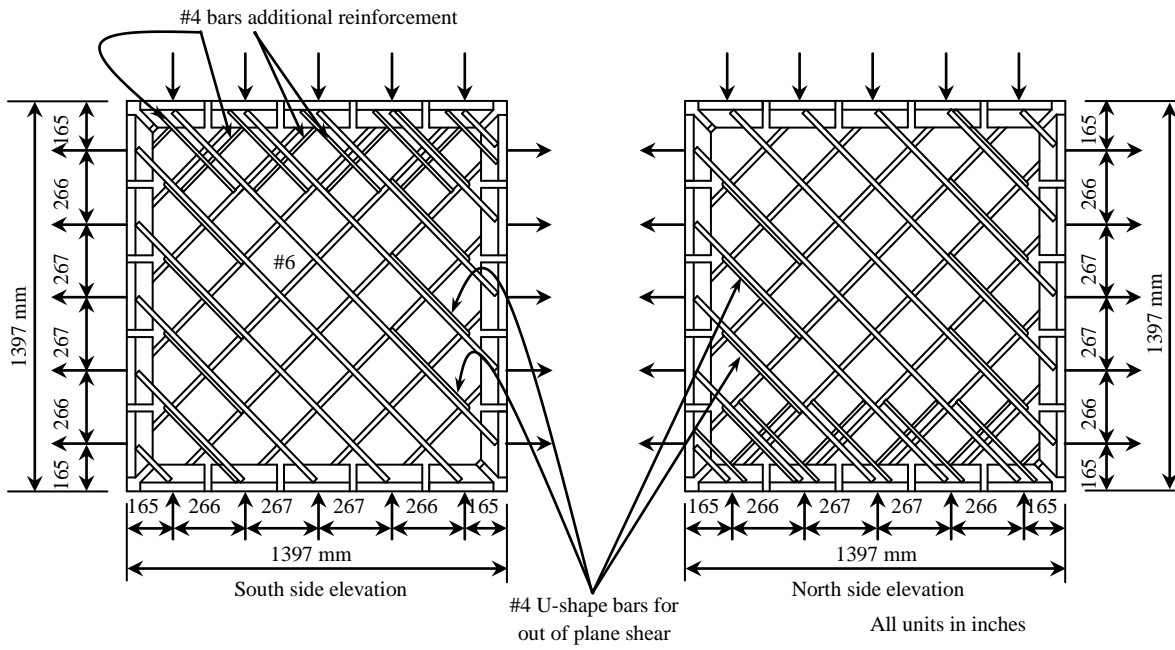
Reinforcement layout of panels OP0, OP1, OP2, and OP3
